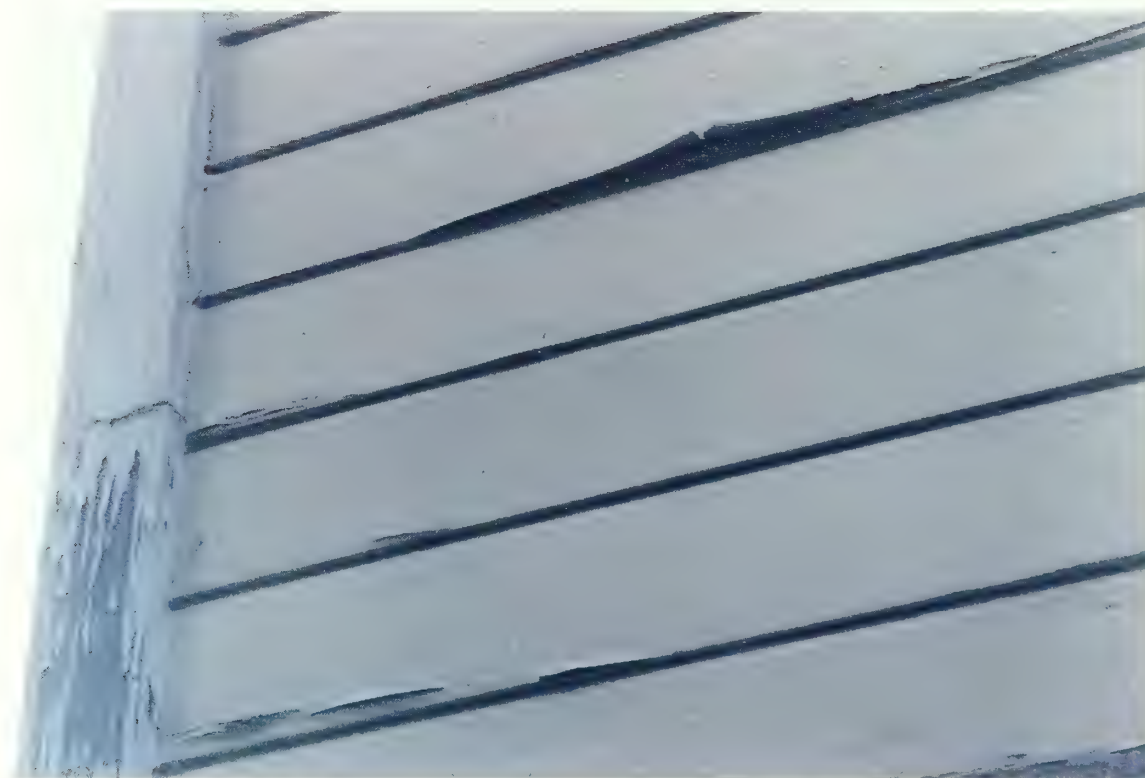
Close-up view of replacement German siding on the southwest elevation. Notice the peeling paint.
